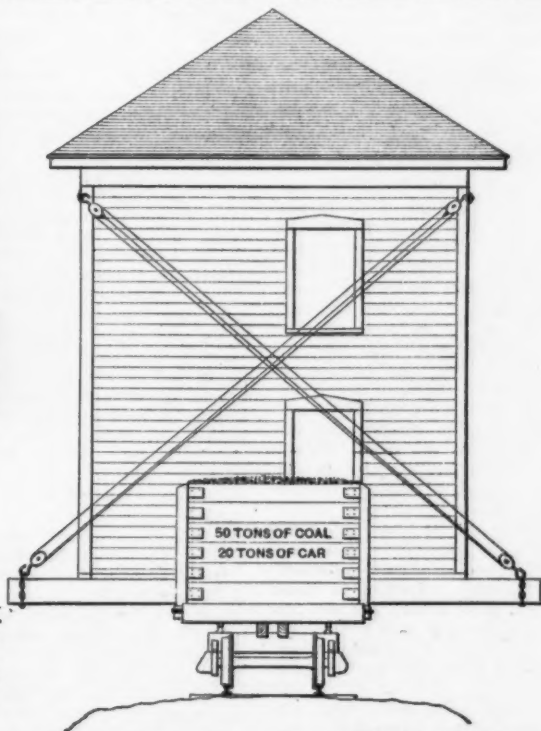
Building Loaded on Cars and Anchored to Coal Cars.—Scale, $\frac{1}{4}$ In. to the Foot.
